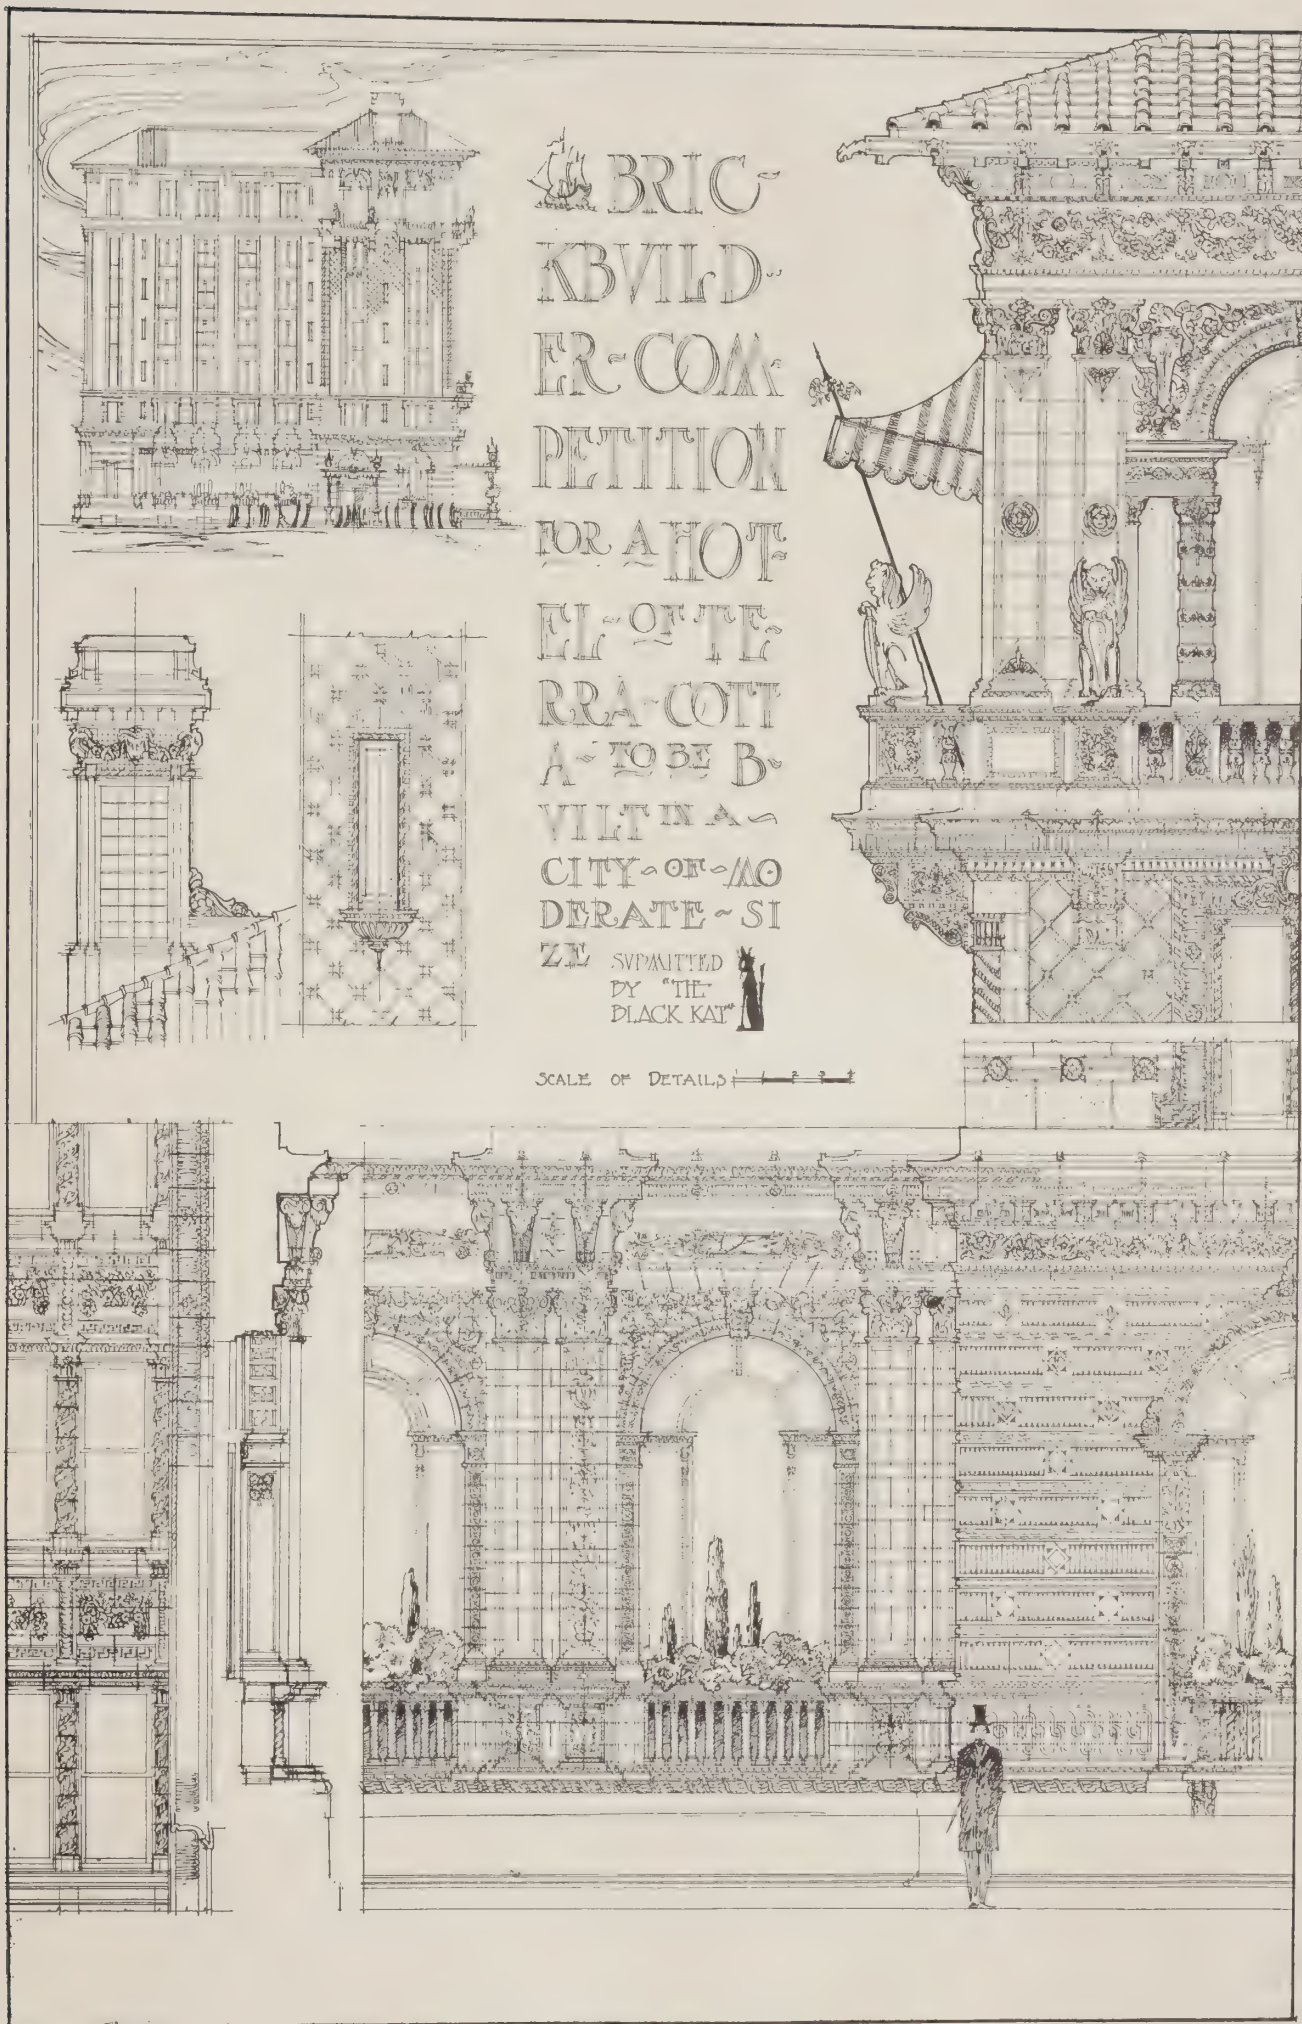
DETAILS BY WALTER WATSON COOK, BOSTON, MASS.
